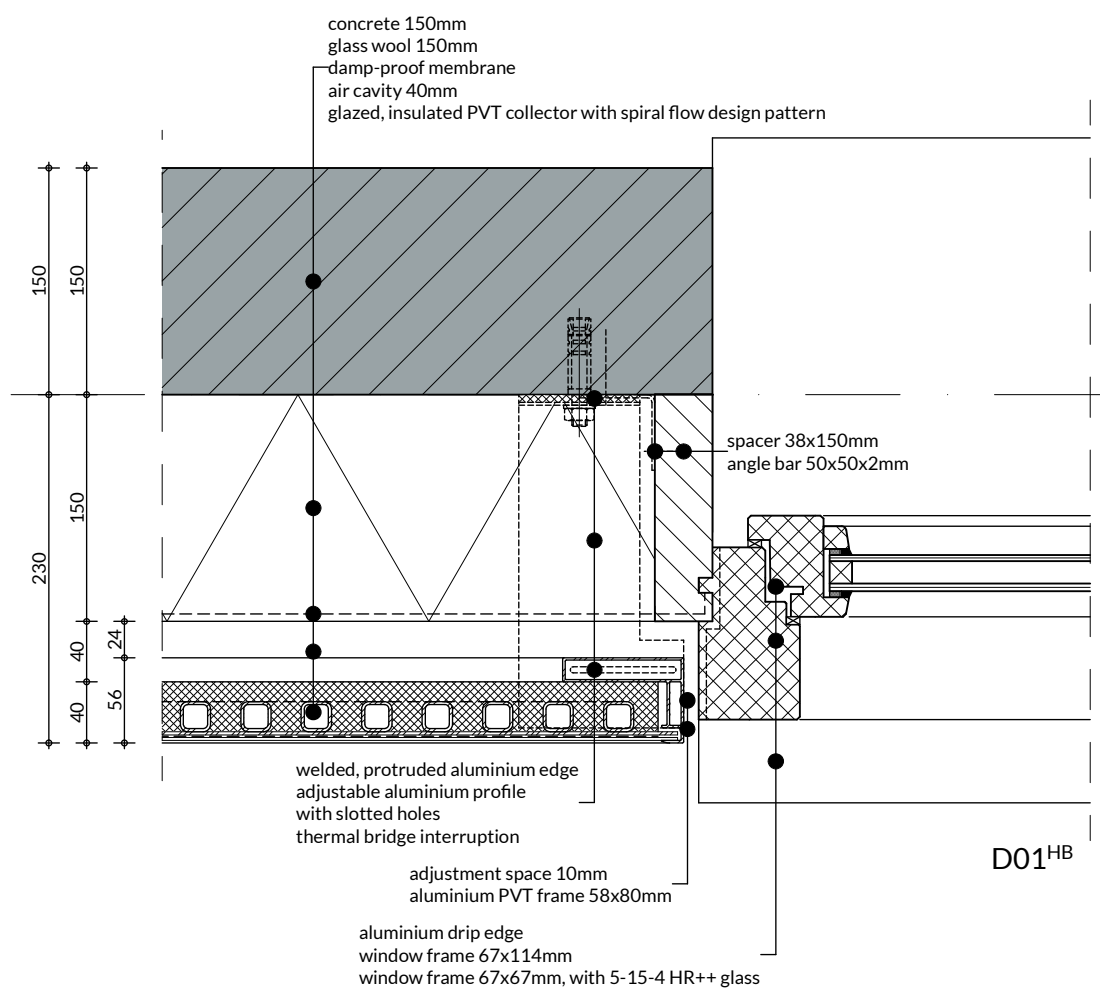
Cavity wall detail D01^{HB}, with the connection between PVT and the window (scale 1:5; own illustration).
